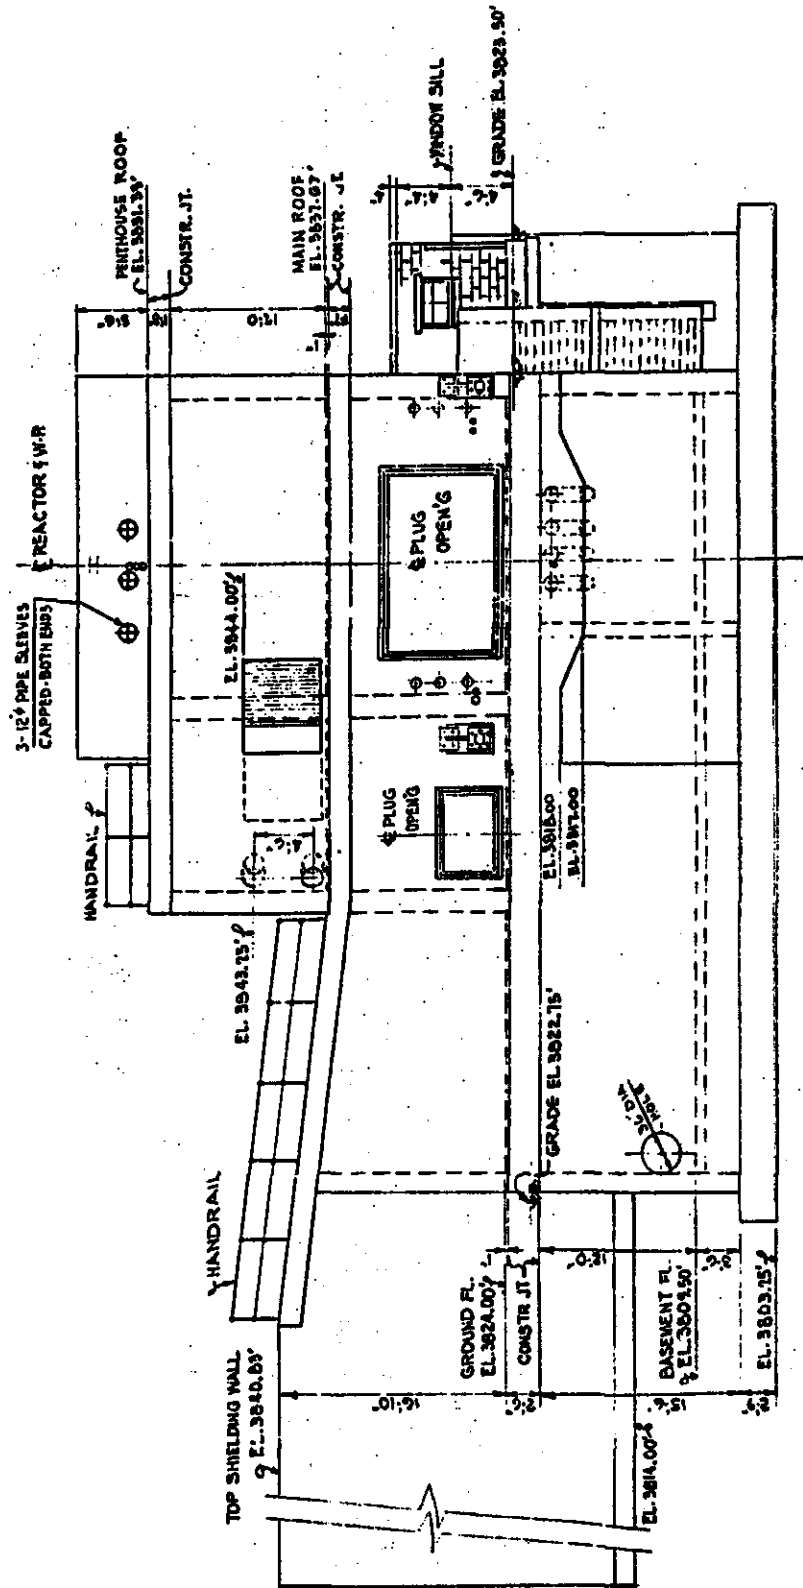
Test Cell C, Building 3210, north elevation, ca. 1960.
